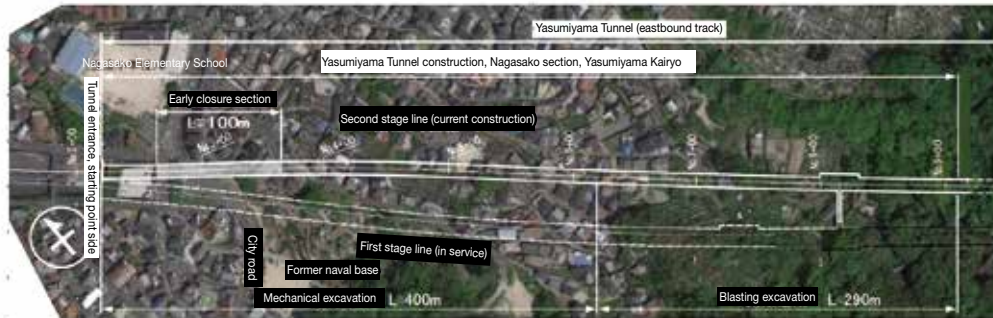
Top view of the construction, Yasumiya Tunnel, Nagasaki section
